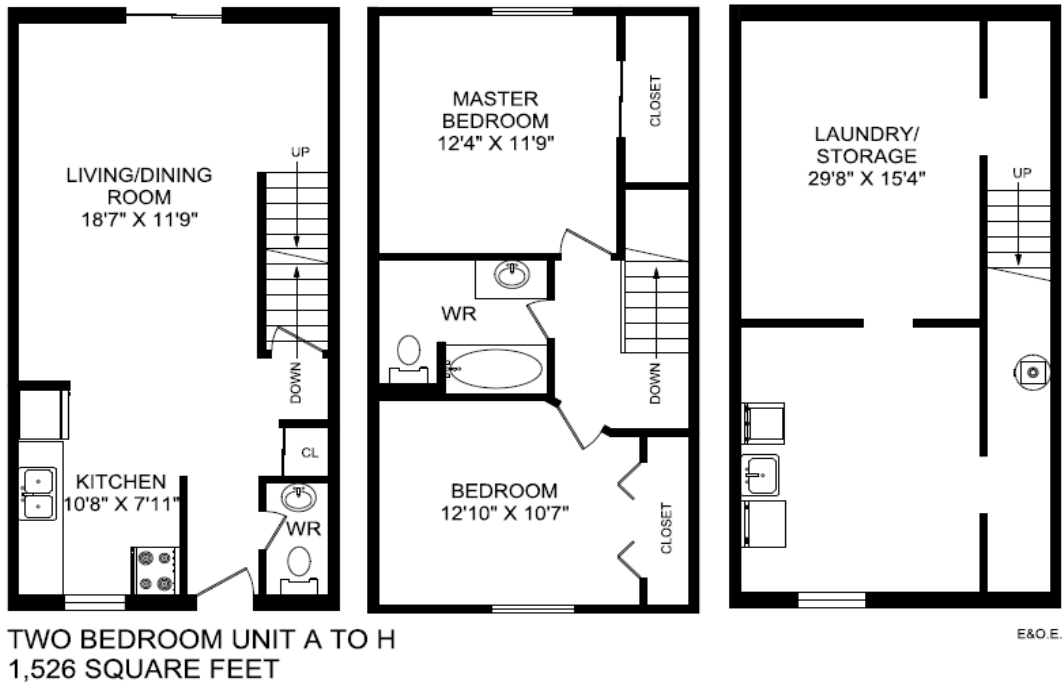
Example layout for a 2-bedroom unit in the rowhouse complex.
